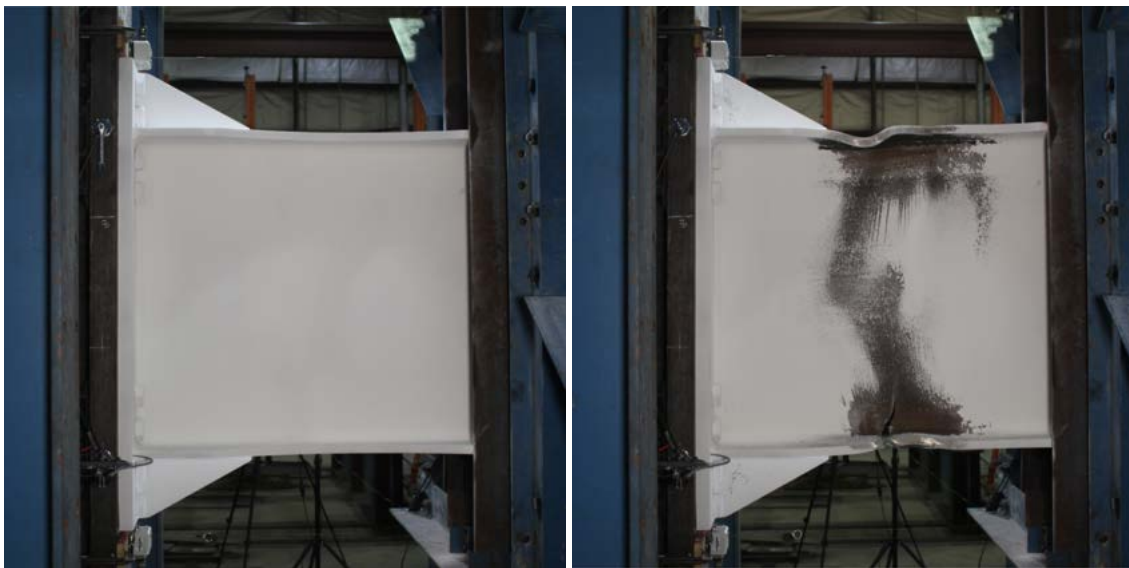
W24RBS-0.375N-T59 bottom flange fracture looking towards the end-plate.
